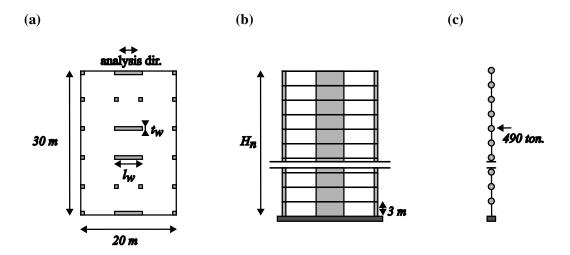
a) Buildings' plan; b) Buildings' elevation; c) Numerical model
